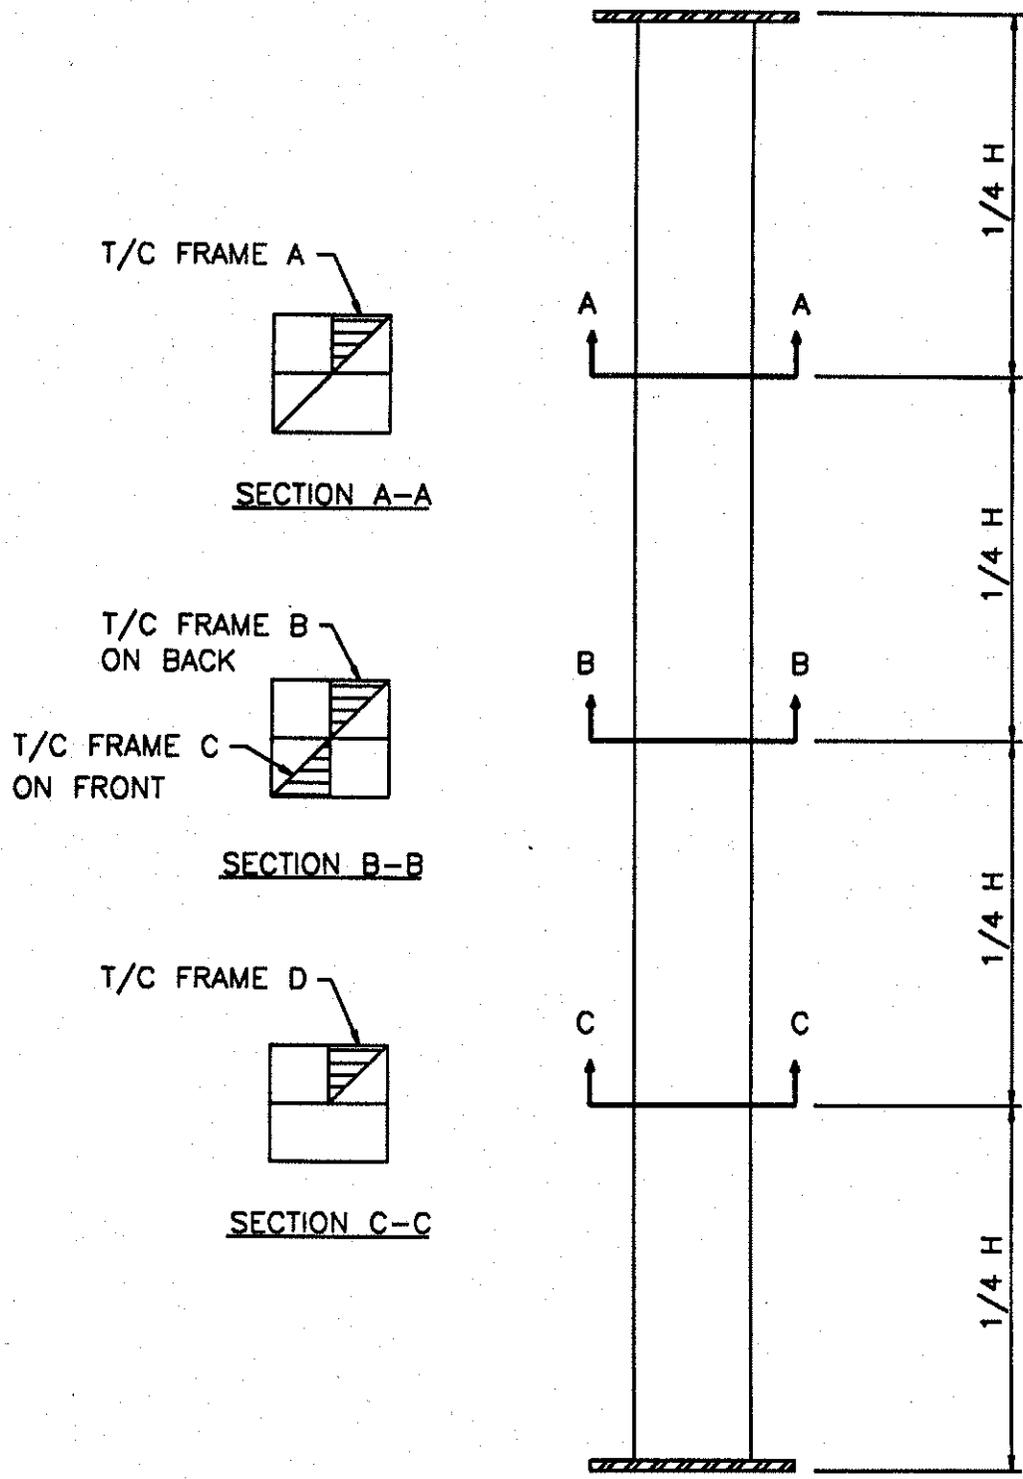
LAYOUT OF T/C FRAMES IN CONCRETE: COLUMN NO. 1 (305 x 305 mm, 4 BARS)
